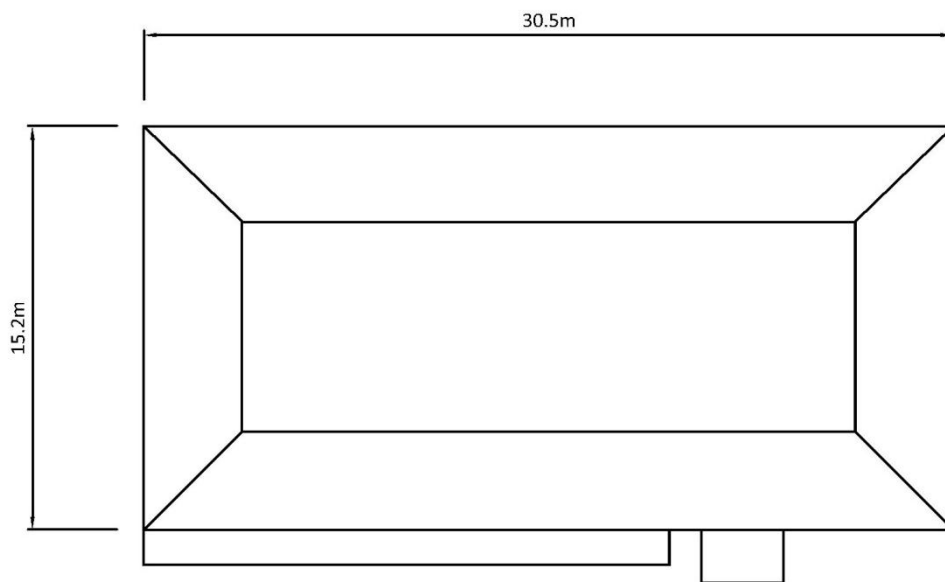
Floor plan of the office building modeled in EnergyPlus
